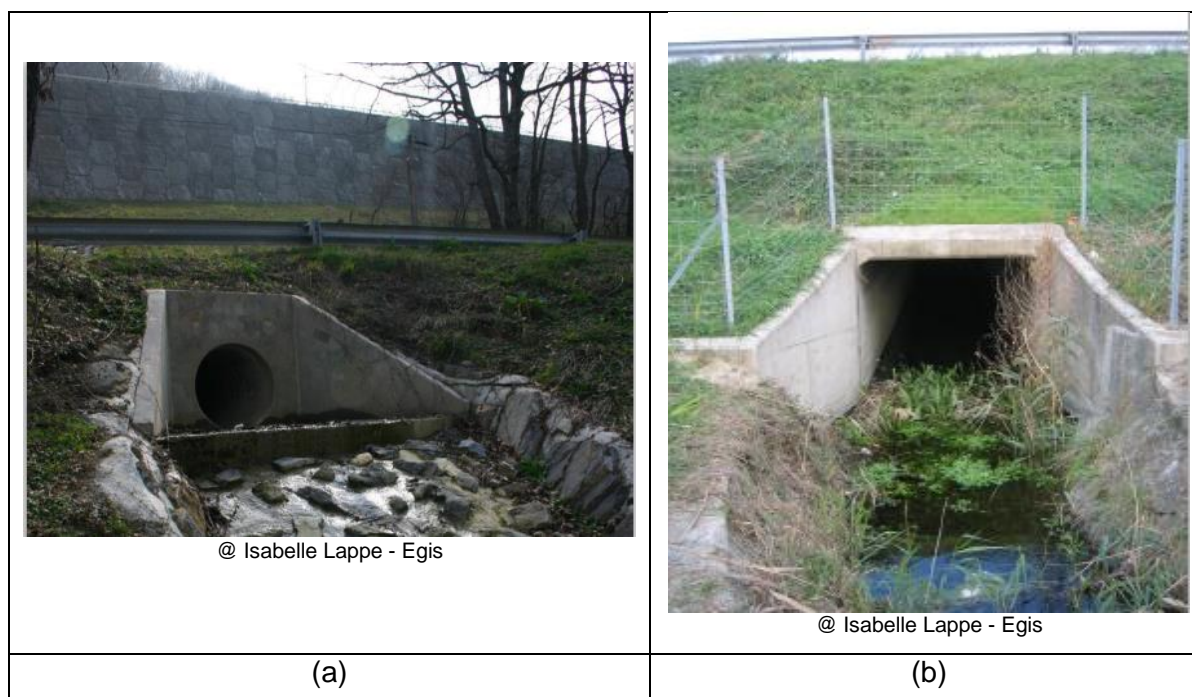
Crossing Structures : (a) Concrete Pipe, (b) Concrete Box Culvert
